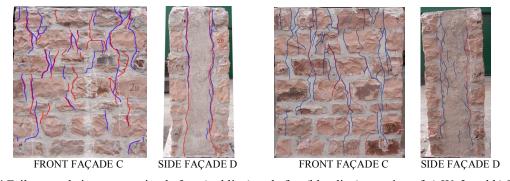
Failure mode in compression before (red line) and after (blue line) grouting of a) W. 2 and b) W. 4
